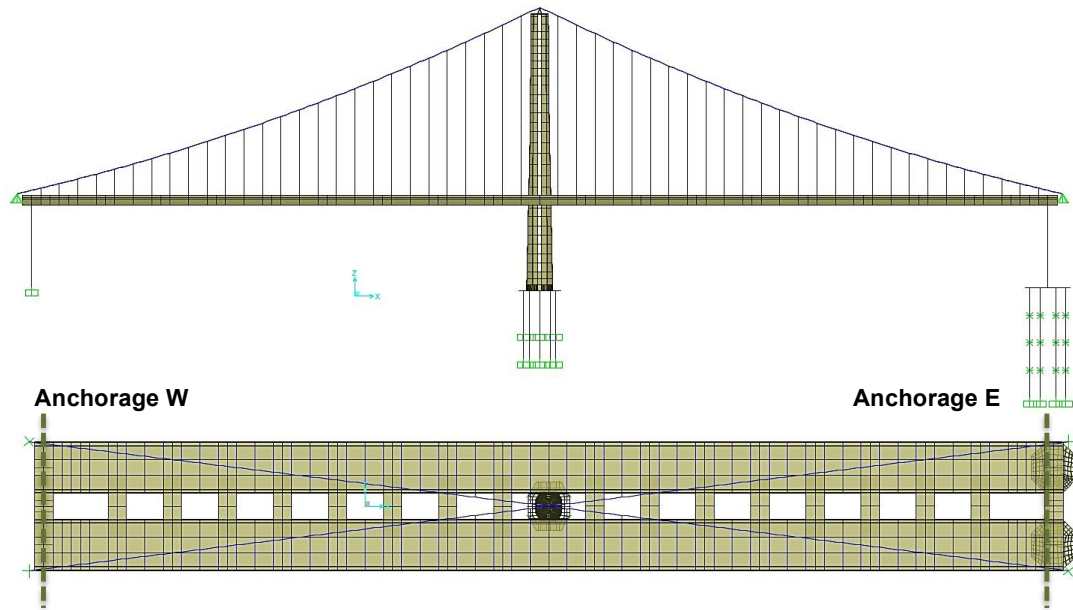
SAP2000 symmetric design of ground-anchored bridge.
